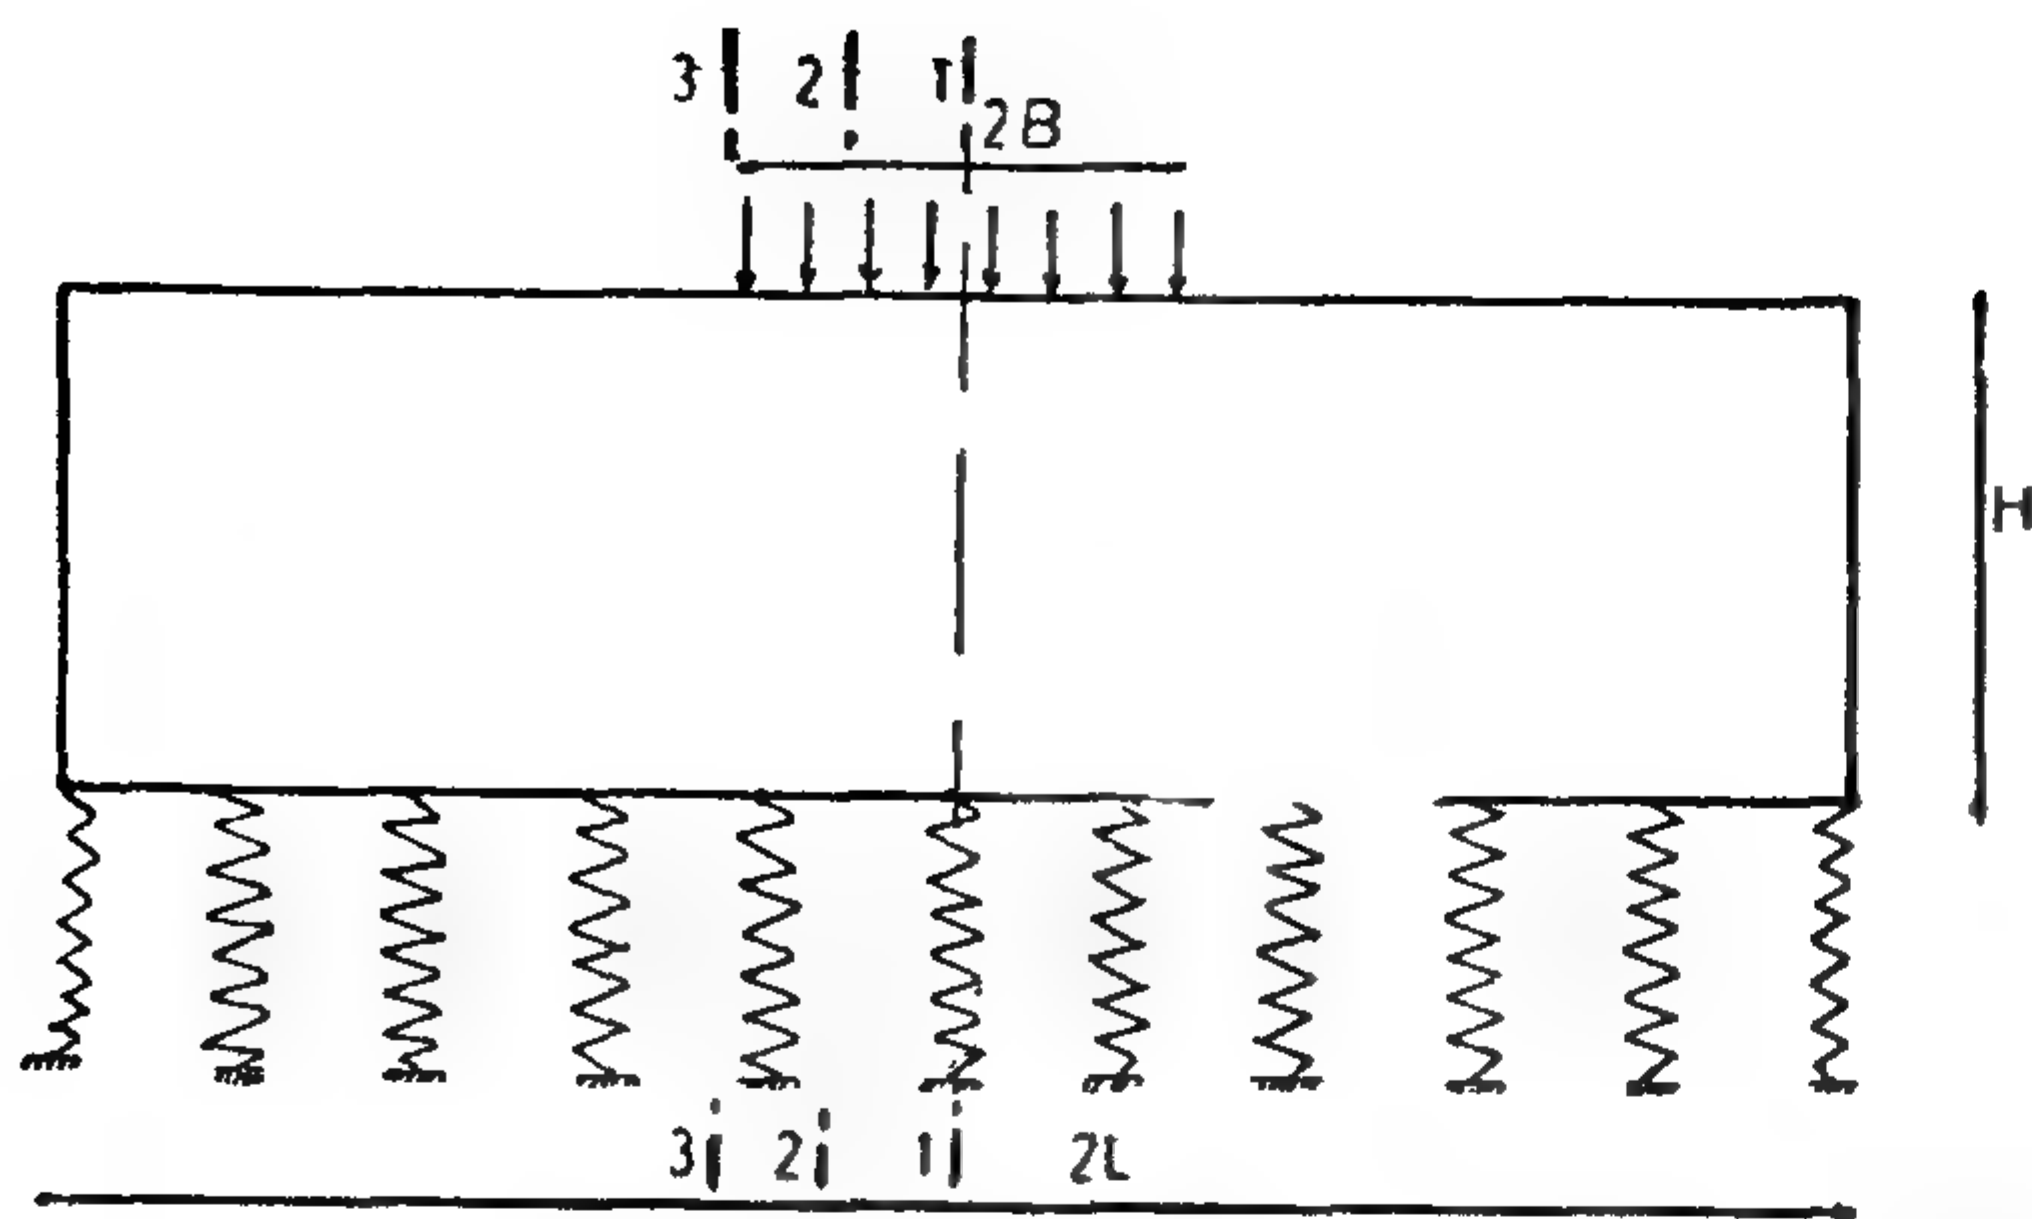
FOOTING AND WALL DIMENSIONS AND THE CRITICAL SECTIONS
